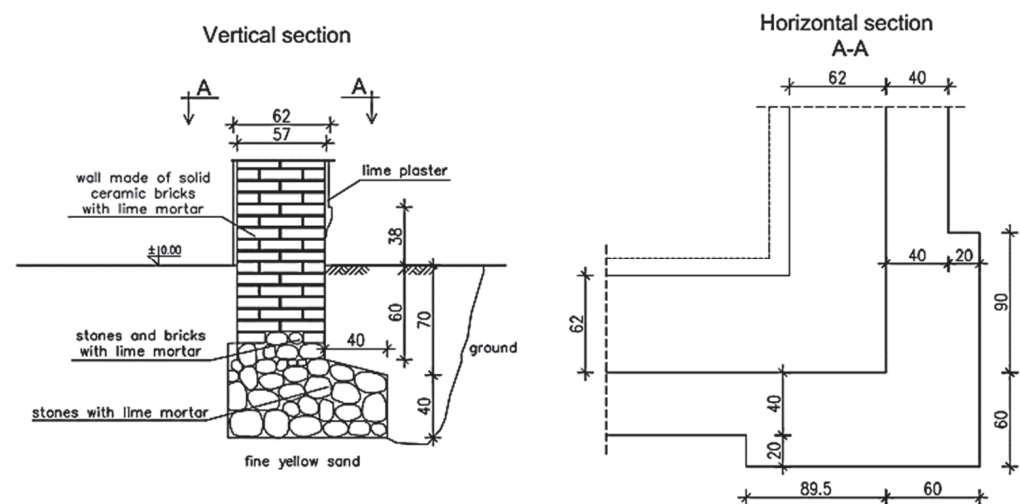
Vertical and horizontal sections of the foundation extension in the building corner.
